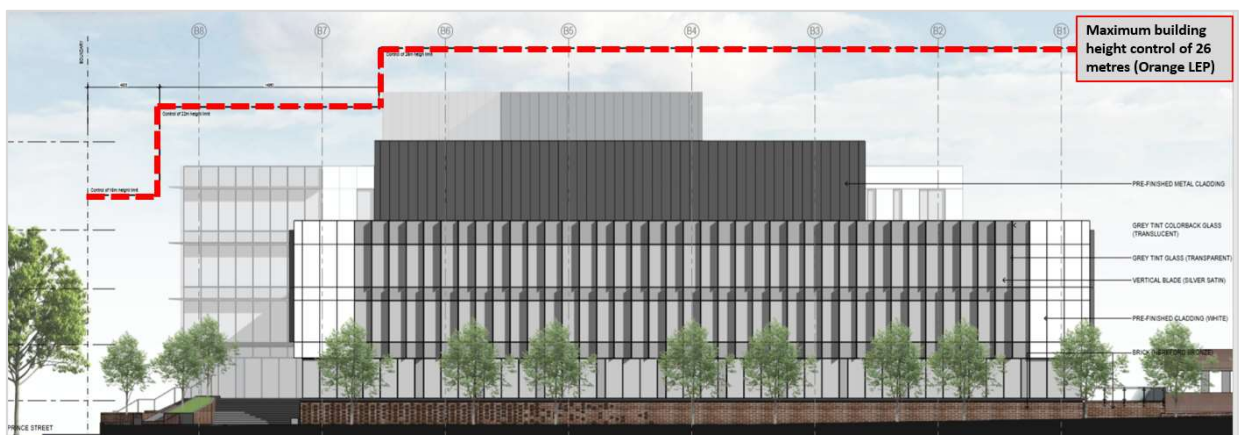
Eastern elevation – view from Anson Street (Source: Group GSA)
